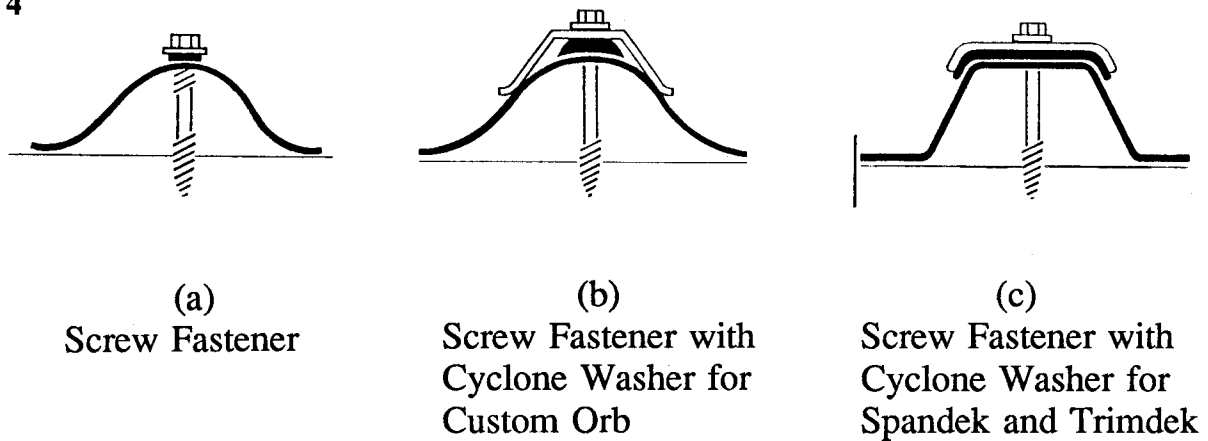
SCREW FASTENER AND CYCLONE WASHERS
